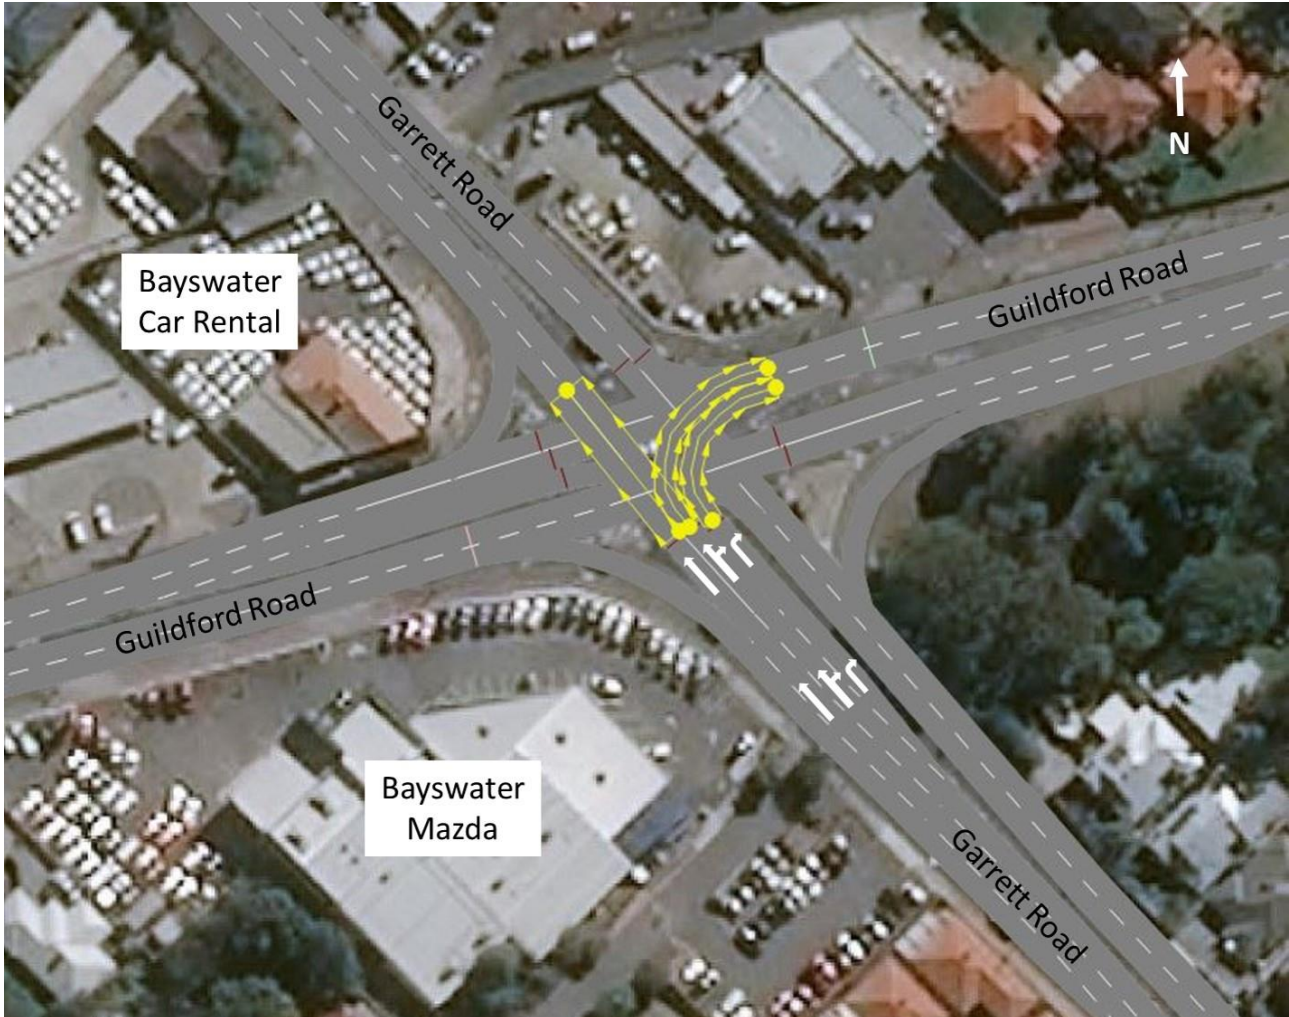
Guildford Road / Garrett Road Proposed Intersection Layout
